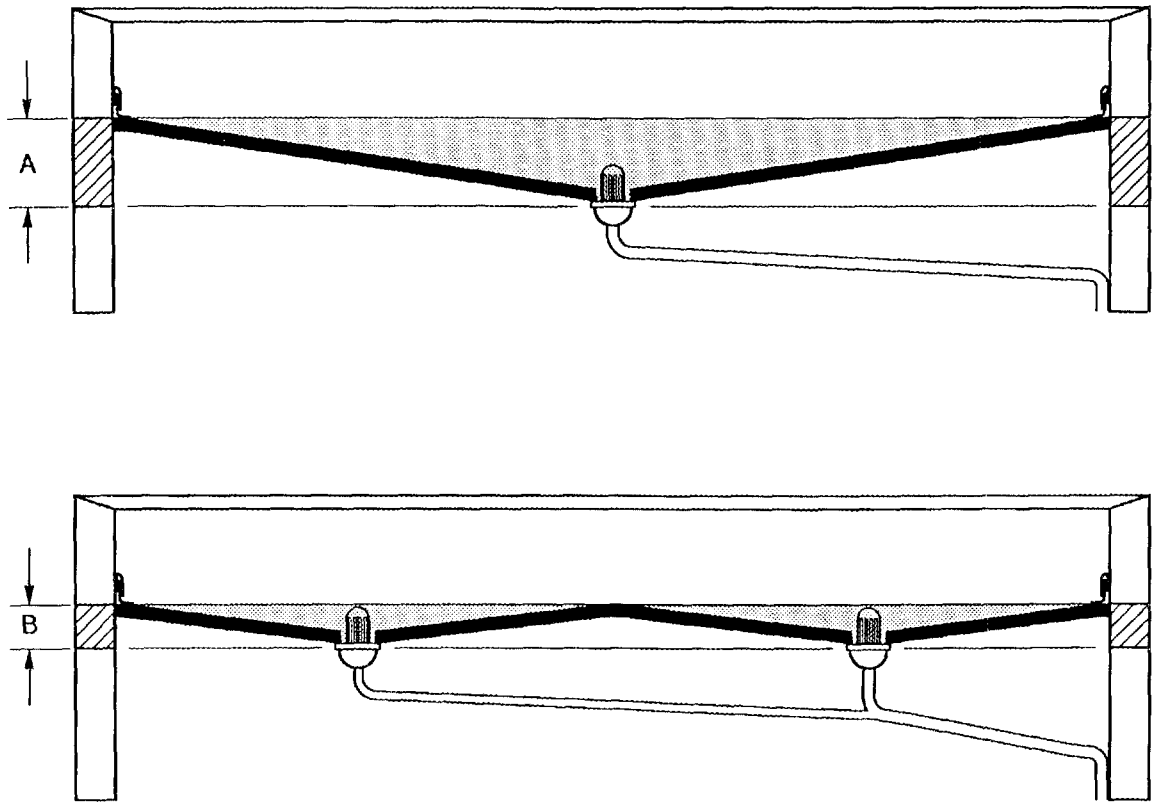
The relationship between a waterproof roof drainage system and the amount of building closure is illustrated above. Both roofs have the same slope. The top roof has a single drainage area, while the lower roof has two. As a result, the amount of added building closure in drawing A (top) is twice that of drawing B (bottom).
